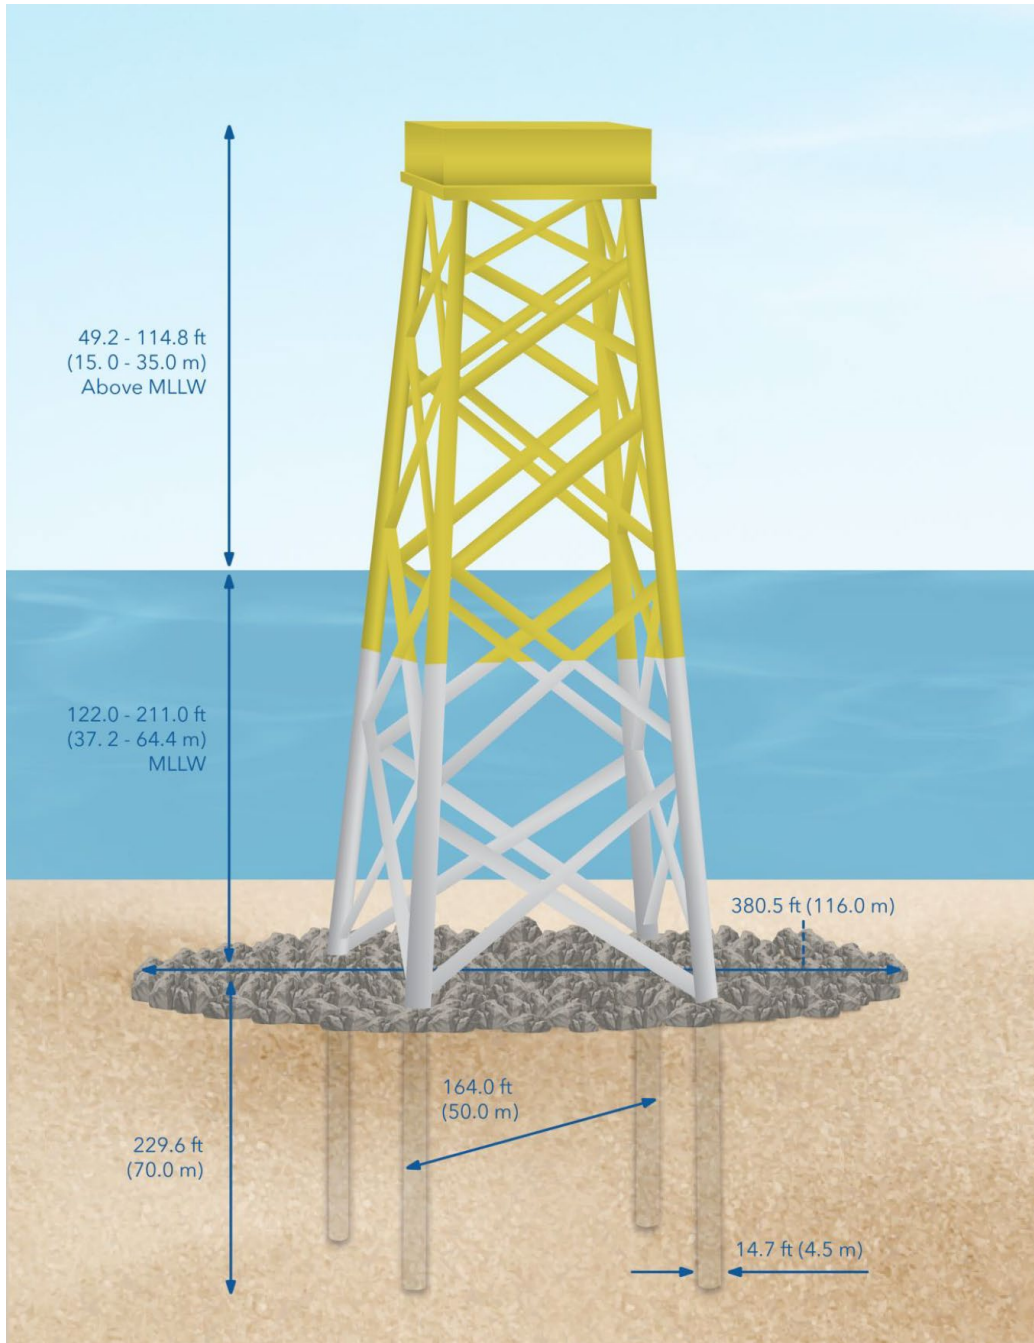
Indicative WTG piled jacket foundation diagram
